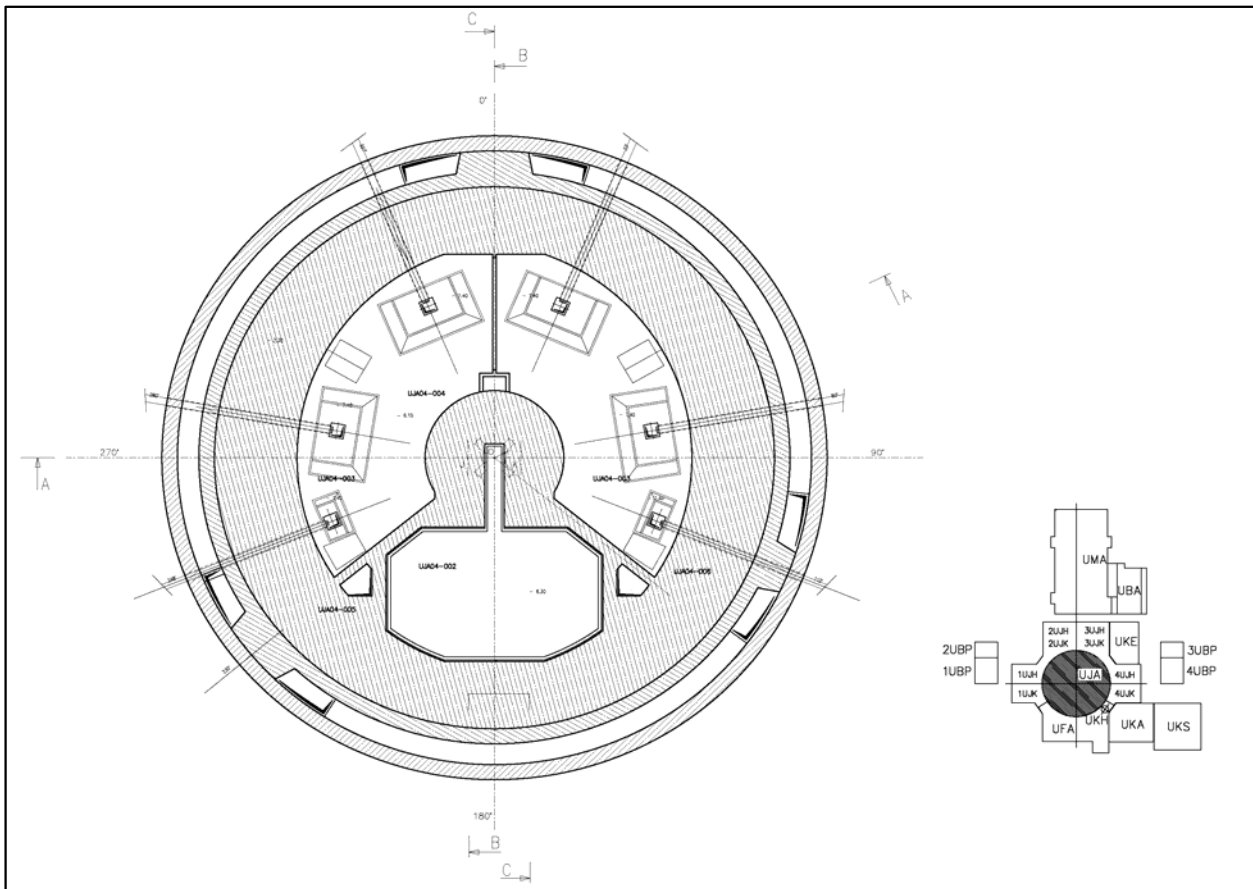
5: REACTOR BUILDING PLAN VIEW +1.5 M
